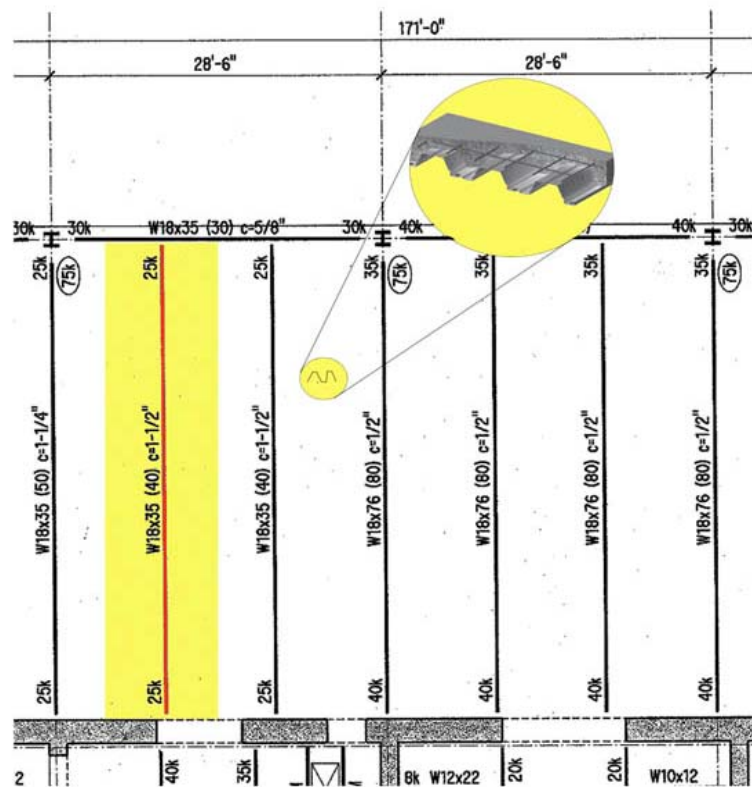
Level 27 Beam and Deck Spot Check Locations
